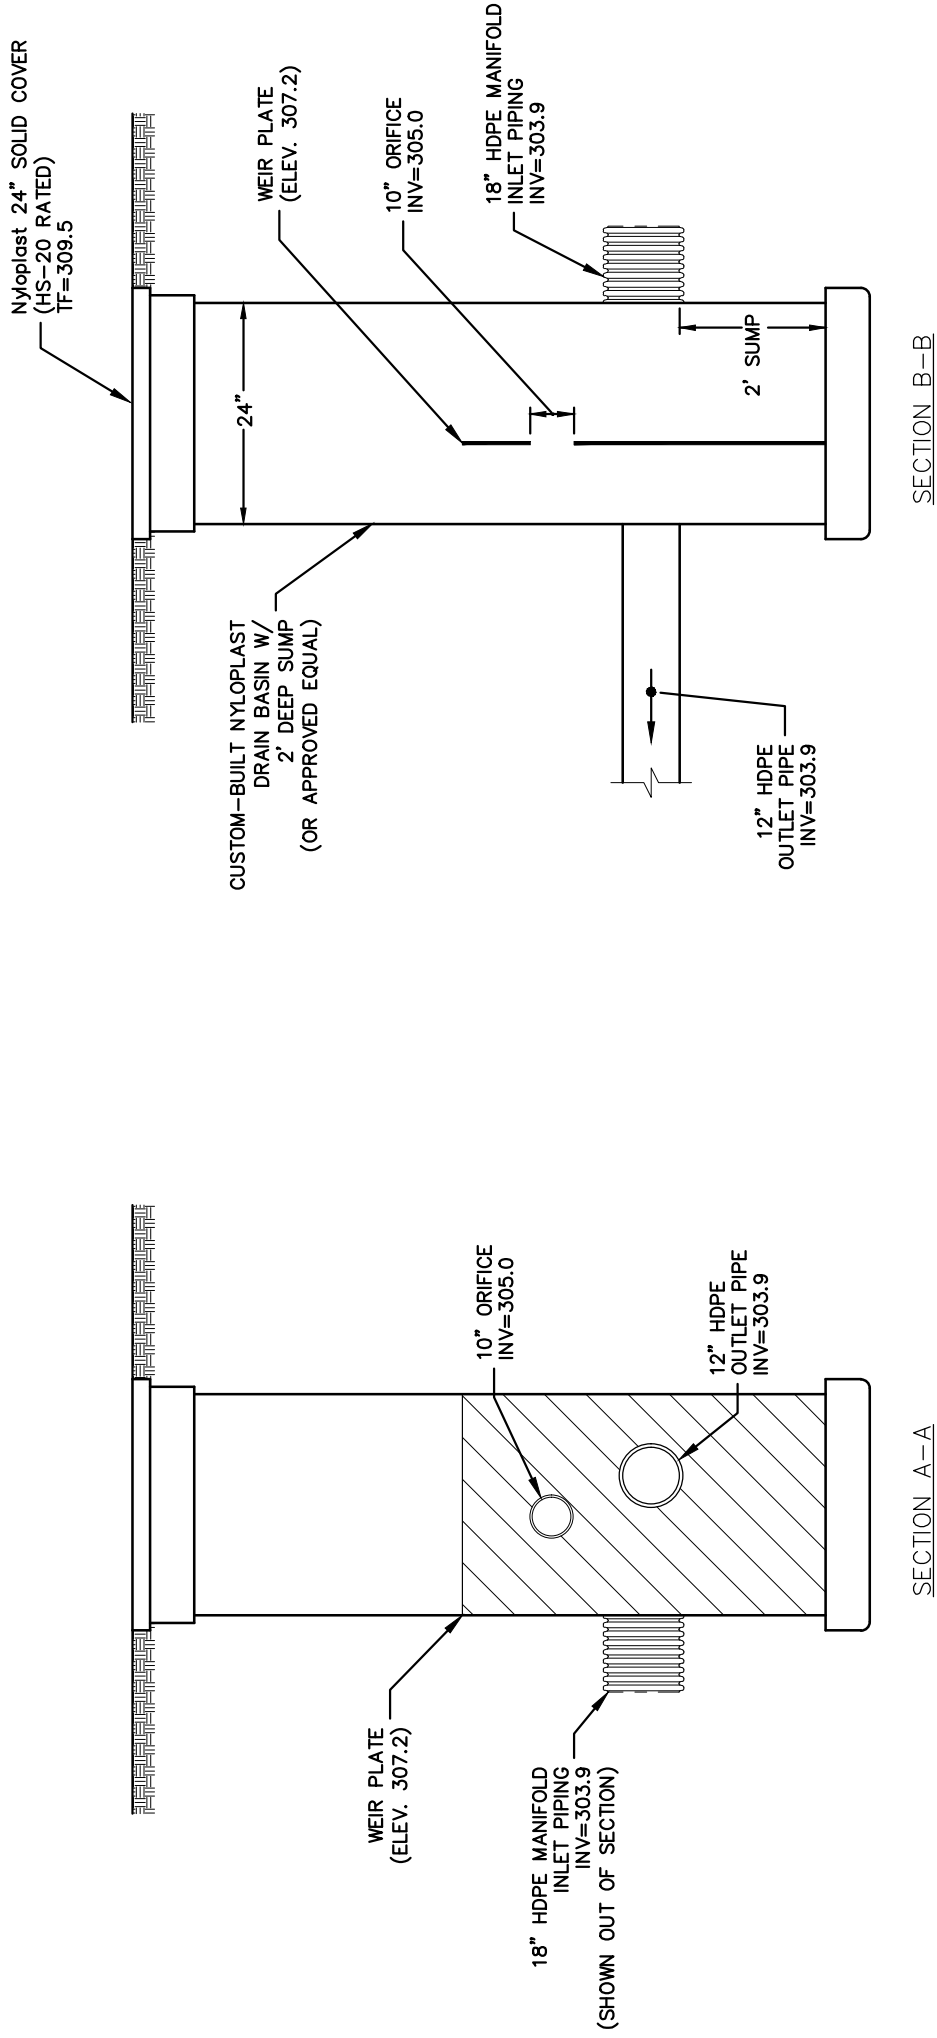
OUTLET CONTROL STRUCTURE AND PIPING DETAIL
